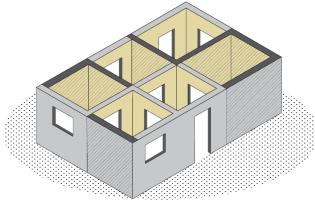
Strong walls are well distributed throughout the building. Four strong walls resist shaking across the house and three resist shaking along its length. All walls must be tied together by tie beams (not shown).
